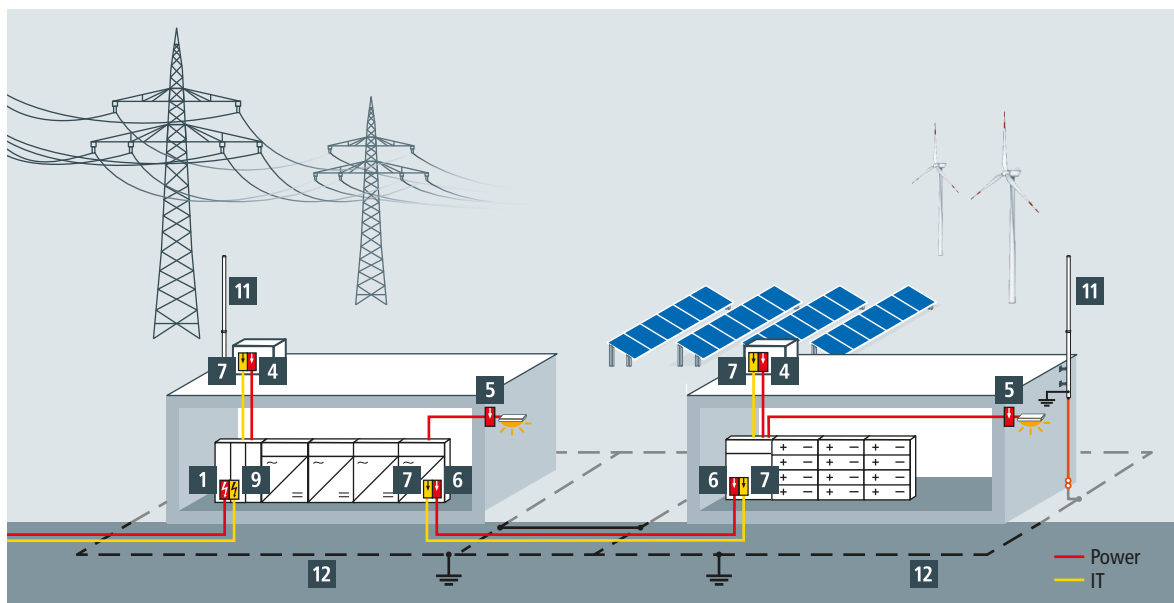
Battery storage system for power grid as a concrete construction with HVI Lightning protection
